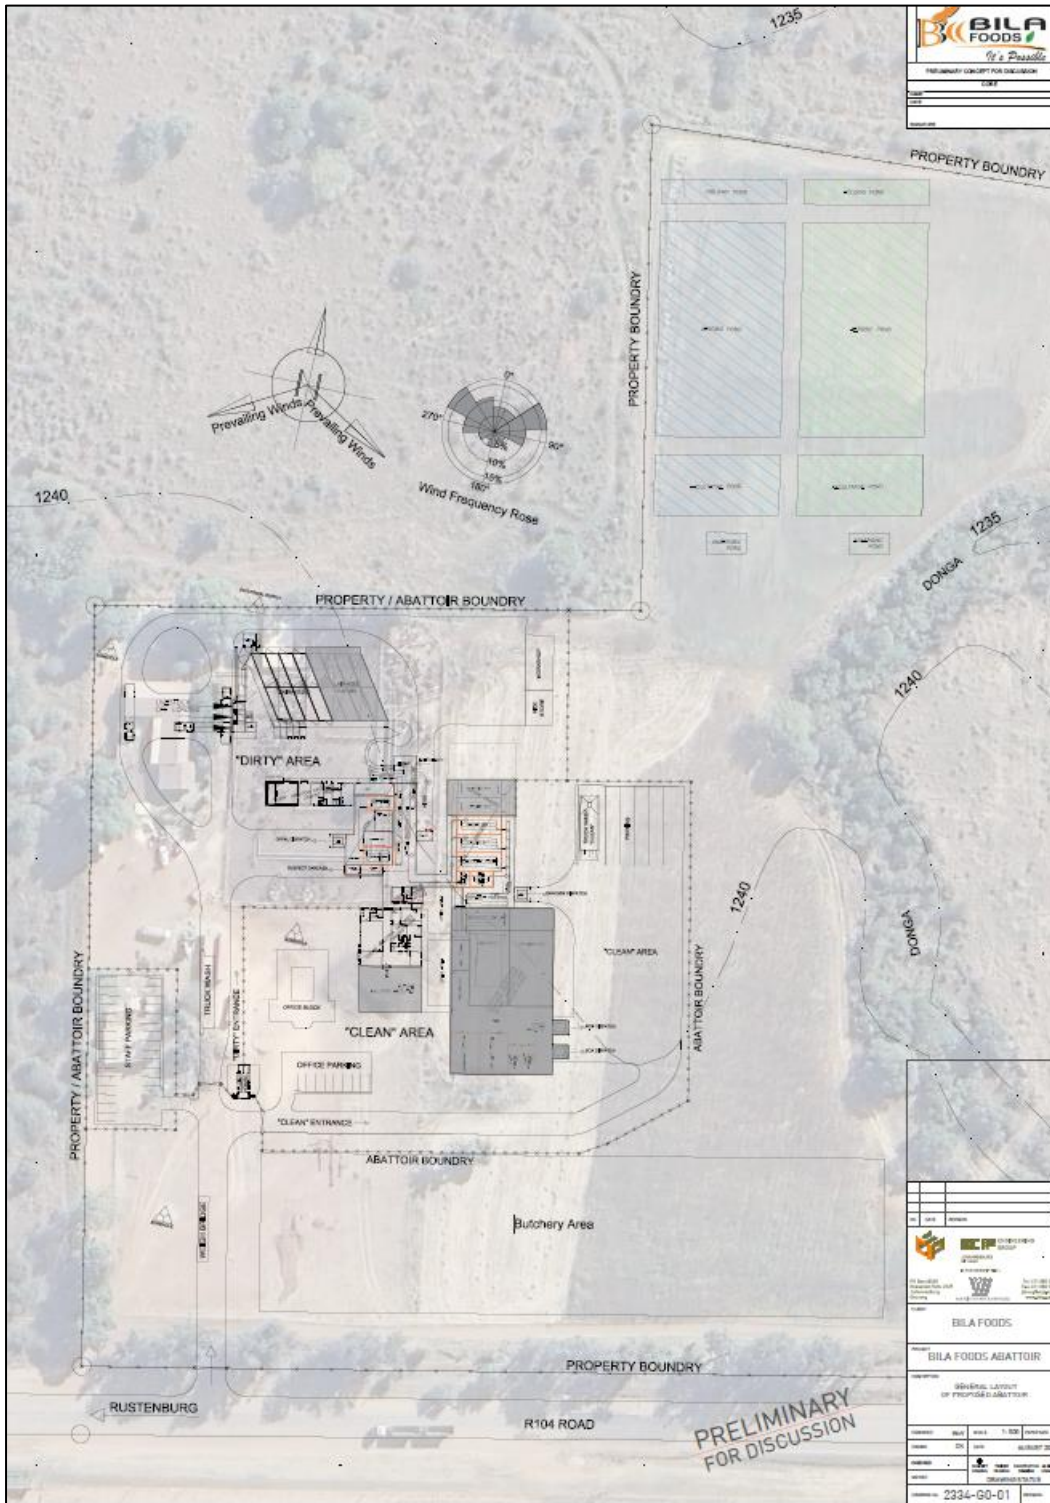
INITIAL PROPOSED LAYOUT OF THE BILA ABATTOIR
